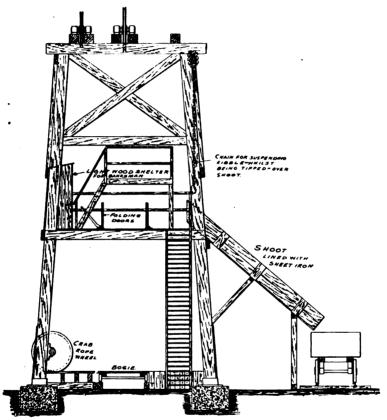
END ELEVATION.—ARRANGEMENT OF HEADGEAR FOR SINKING HORDEN COLLIERY.
